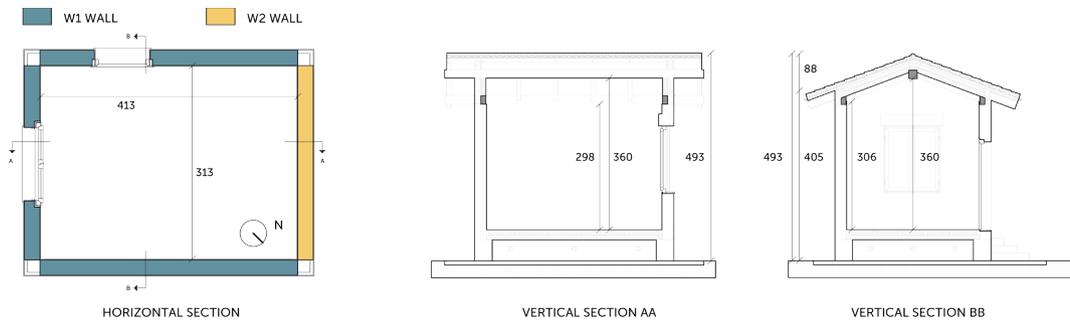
Horizontal and vertical sections of test cells A and B before retrofit (values in centimeter).
